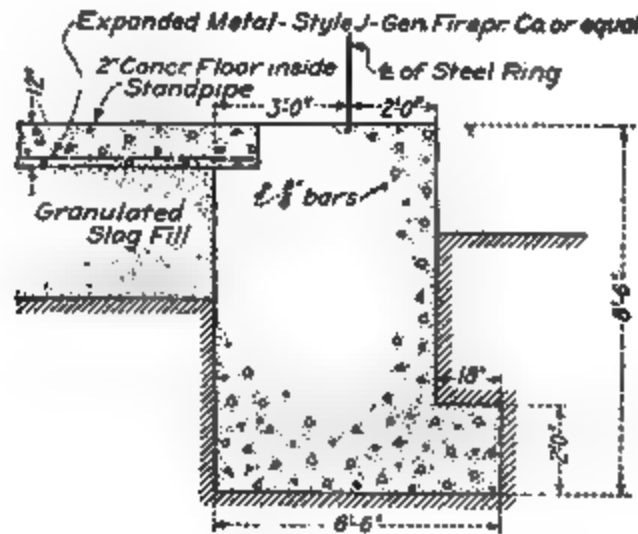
Partial cross-section of foundation of Youngstown standpipe.
